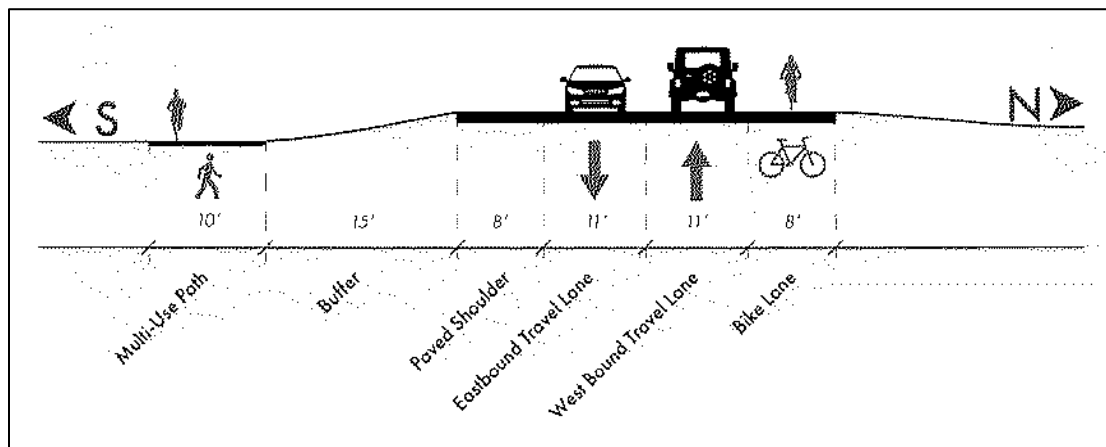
TYPICAL SECTION, SOUTH PARK LOOP ROAD (EAST-WEST ORIENTATION)
